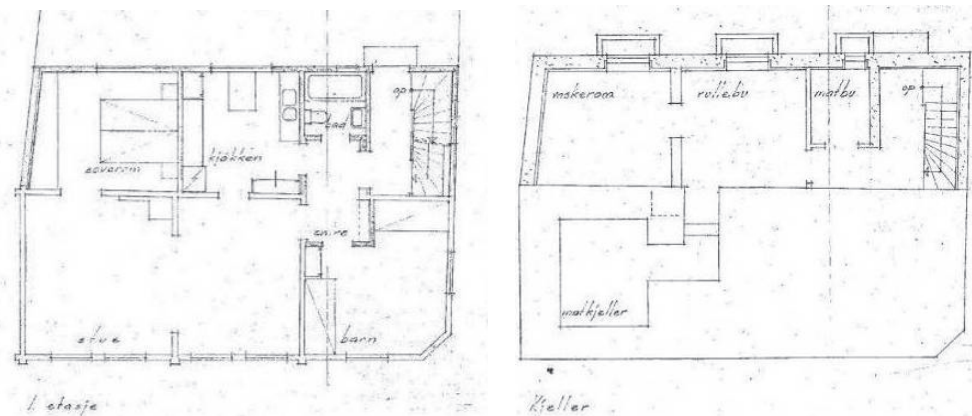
Kjerkgata 60, floor plan of the new house. Ground storey (left) and basement (right). Upstairs there was a separate apartment which replicated the layout of the ground storey: two bedrooms, two sitting rooms, modern kitchen and bathroom. Georg Eliassen’s and Stensaas’ room plans for the ground floor were almost identical; Eliassen based his on the existing building, Stensaas’ a new house. Stensaas’ plan doubled the floorspace by accommodating a full upstairs apartment, which must have been a winning argument for the owner. Architect Johan Stensaas 7/2-1954. (Røros municipal building archive)
